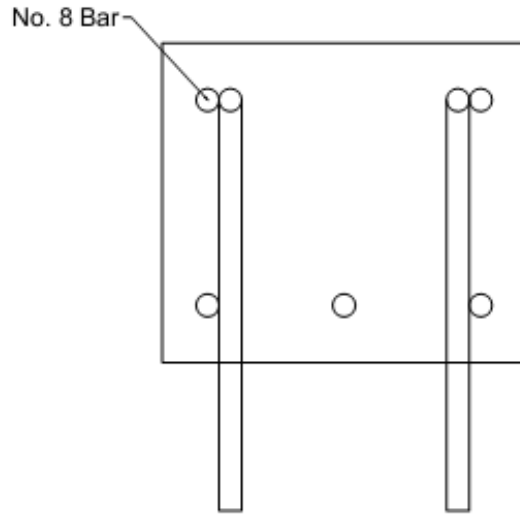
Longitudinal column reinforcement-5 No. 8 bars. Transverse reinforcement not shown.
